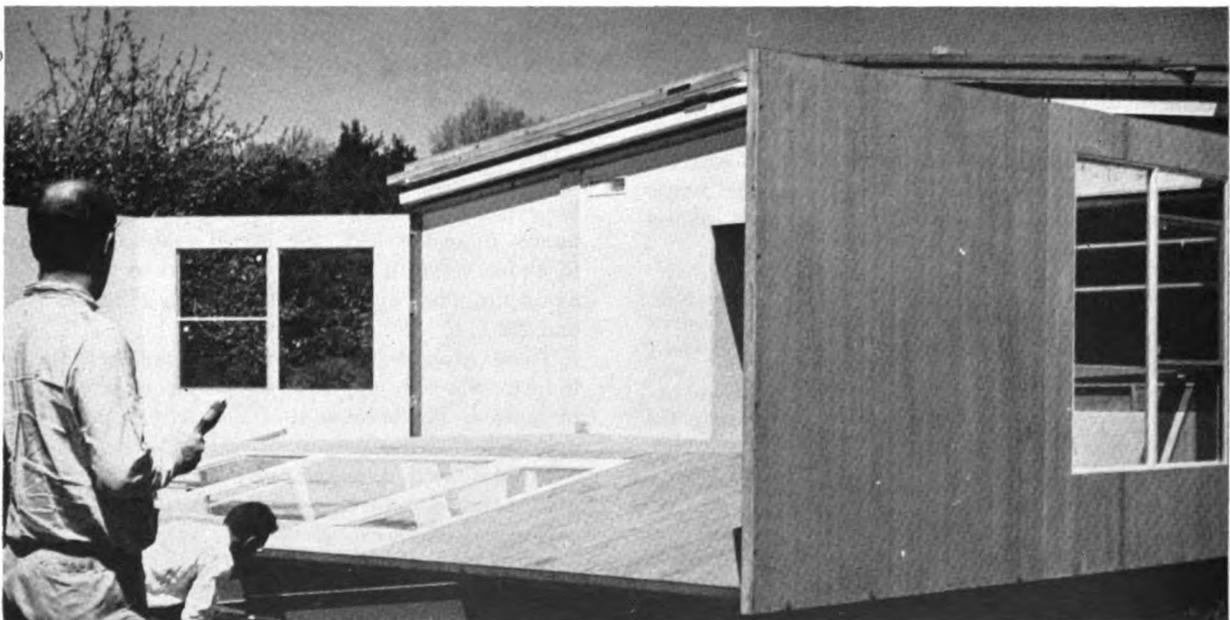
Assembling sandwich panels for Acorn House
